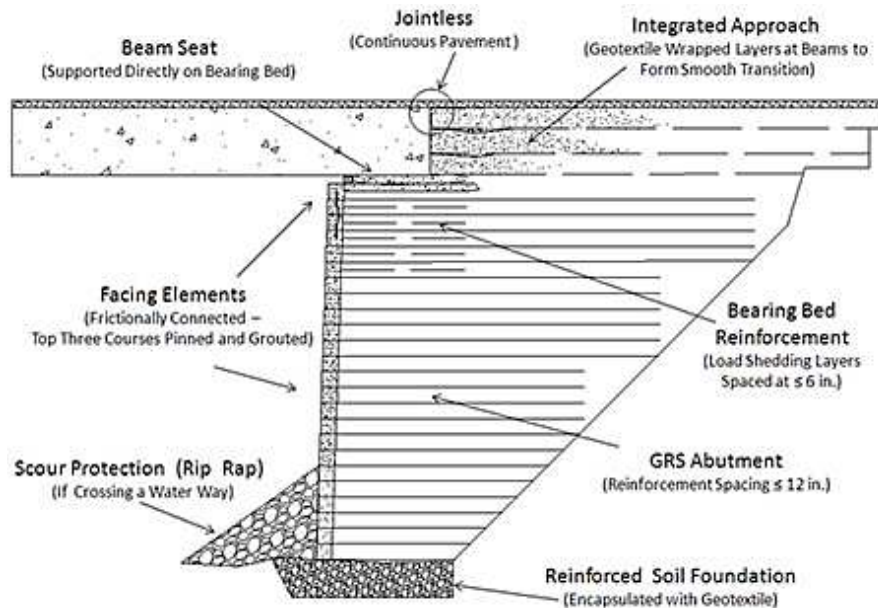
Typical GRS-integrated bridge system cross section (Adams et al., 2011)
